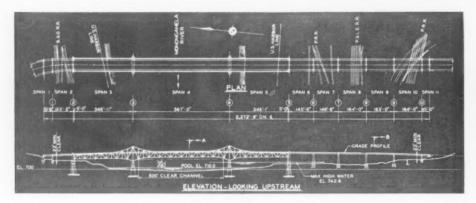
Plan and elevation of Glenwood Bridge over the Monongahela. Total length is governed by the many railroad tracks on both banks. The three span, continuous, Warren type truss over the river totals 1260-ft. in length.
